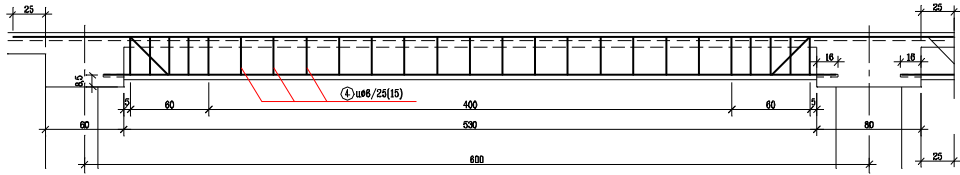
The new beam reinforcement plan: longitudinal cross-section
